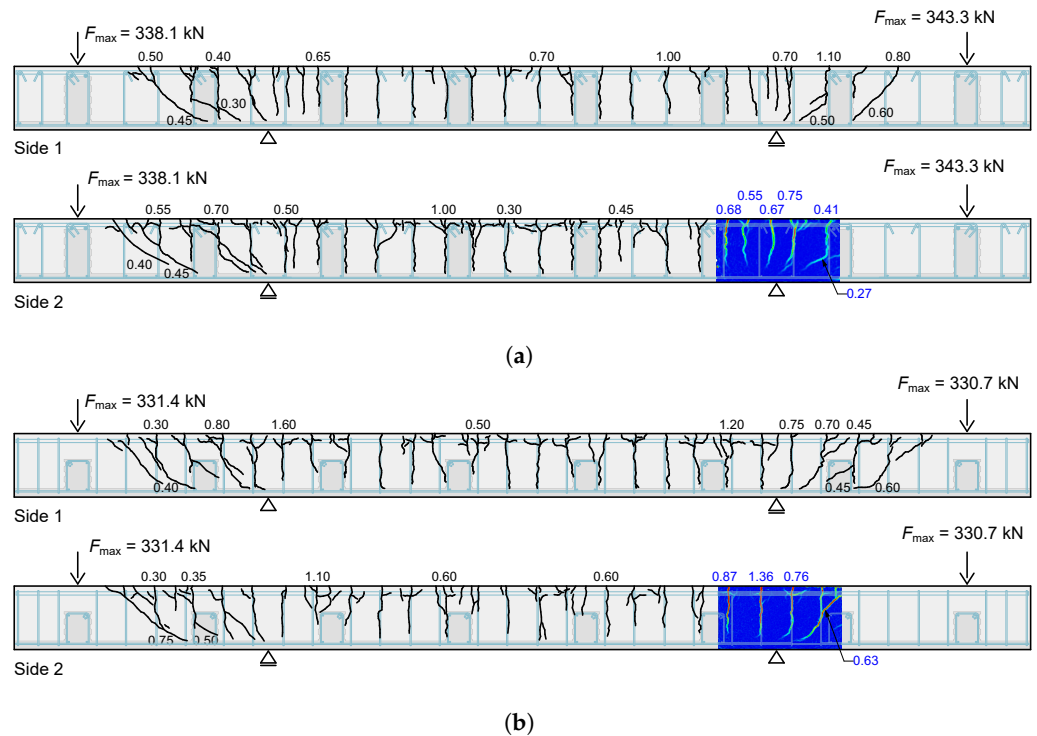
Crack pattern at maximum load  $F_{max}$  (a) Beam N; (b) Beam K (crack opening in mm) [34].
